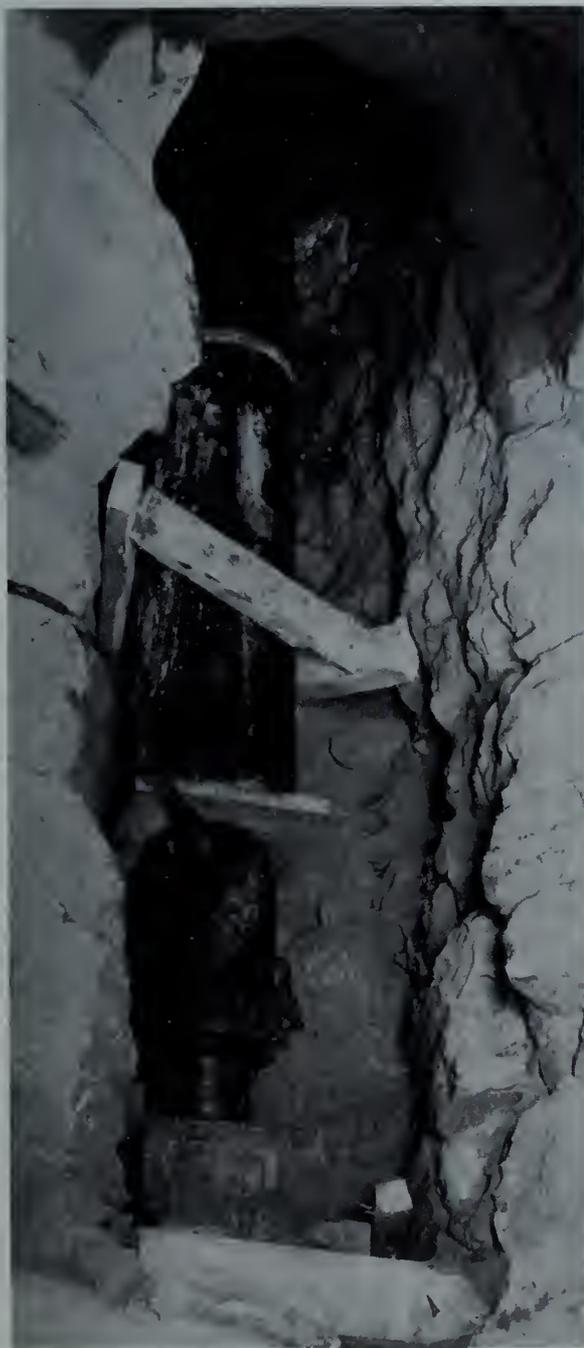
Underpinning the piers. This view shows a pile being jacked down in the south east pier, which is about four feet deeper than the other.
